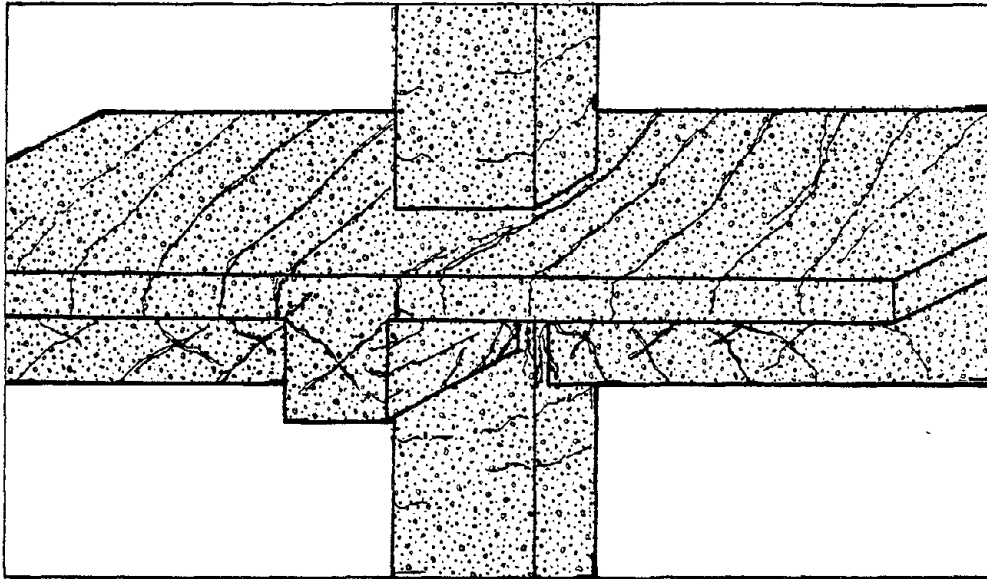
Typical Cracking Pattern in a S-Series Specimen
